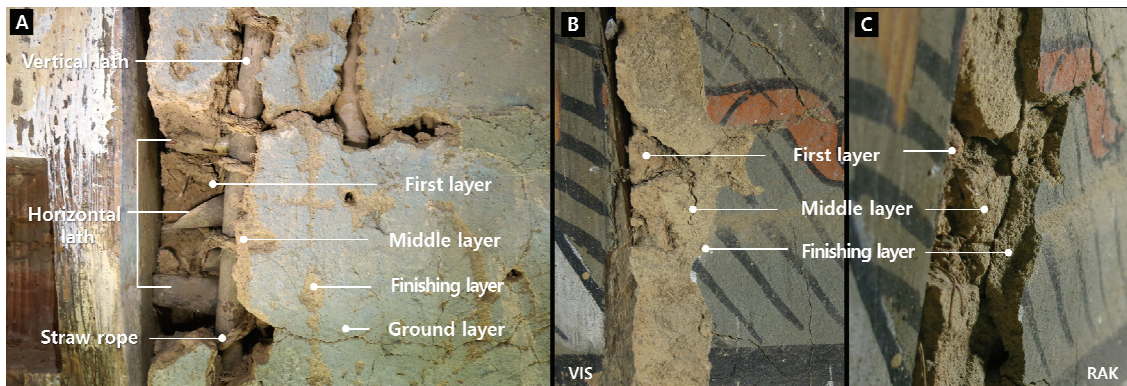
Structure of mural (A: Outside wall of the mural, B and C: Inside wall of the mural).
